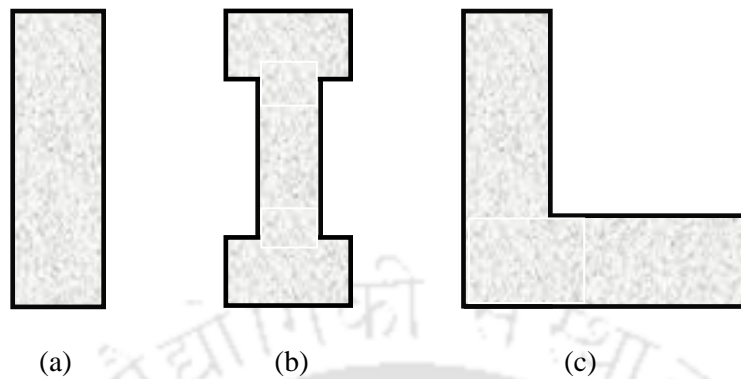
Classification of RC structural walls based on shapes: (a) rectangular wall, (b) barbell wall and (c) flanged wall.
